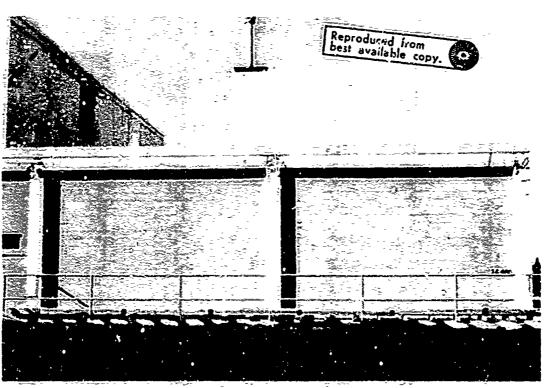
Fast wall of outpatient clinic area showing column C, column B, and corner column A
